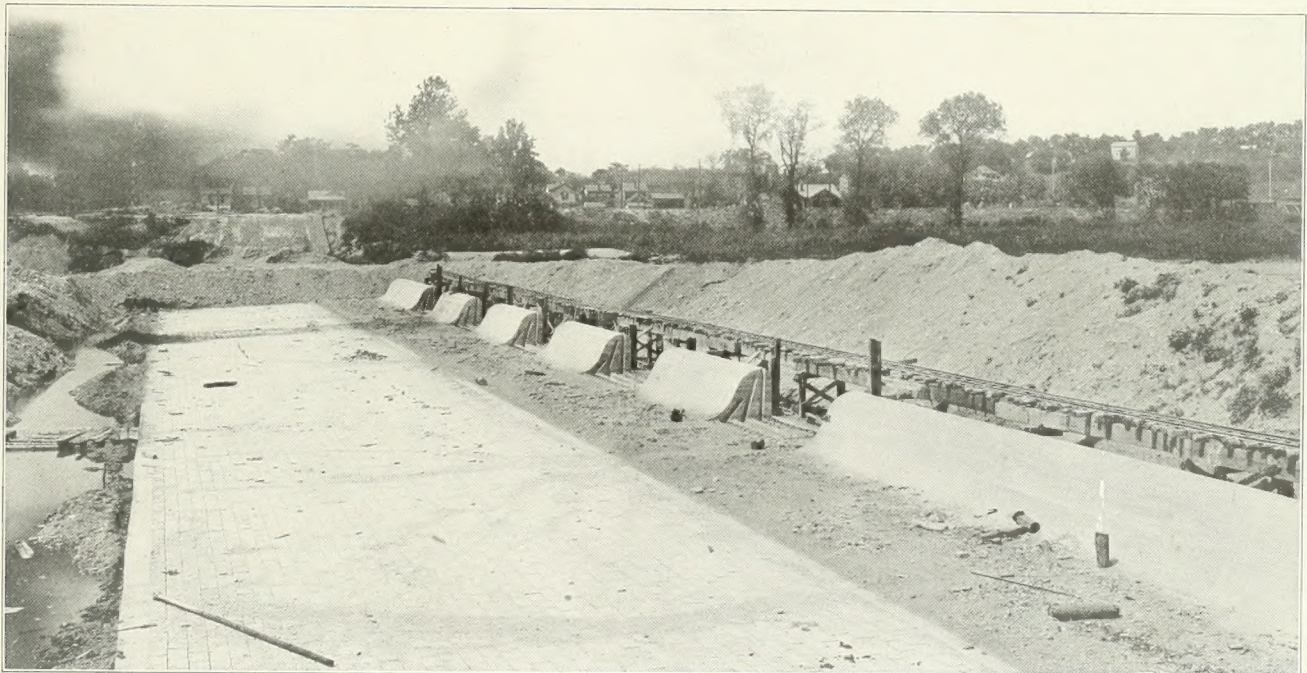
THE FIRST SECTION OF THE BARRIER DAM AT HAMILTON, AUGUST 22, 1922.
